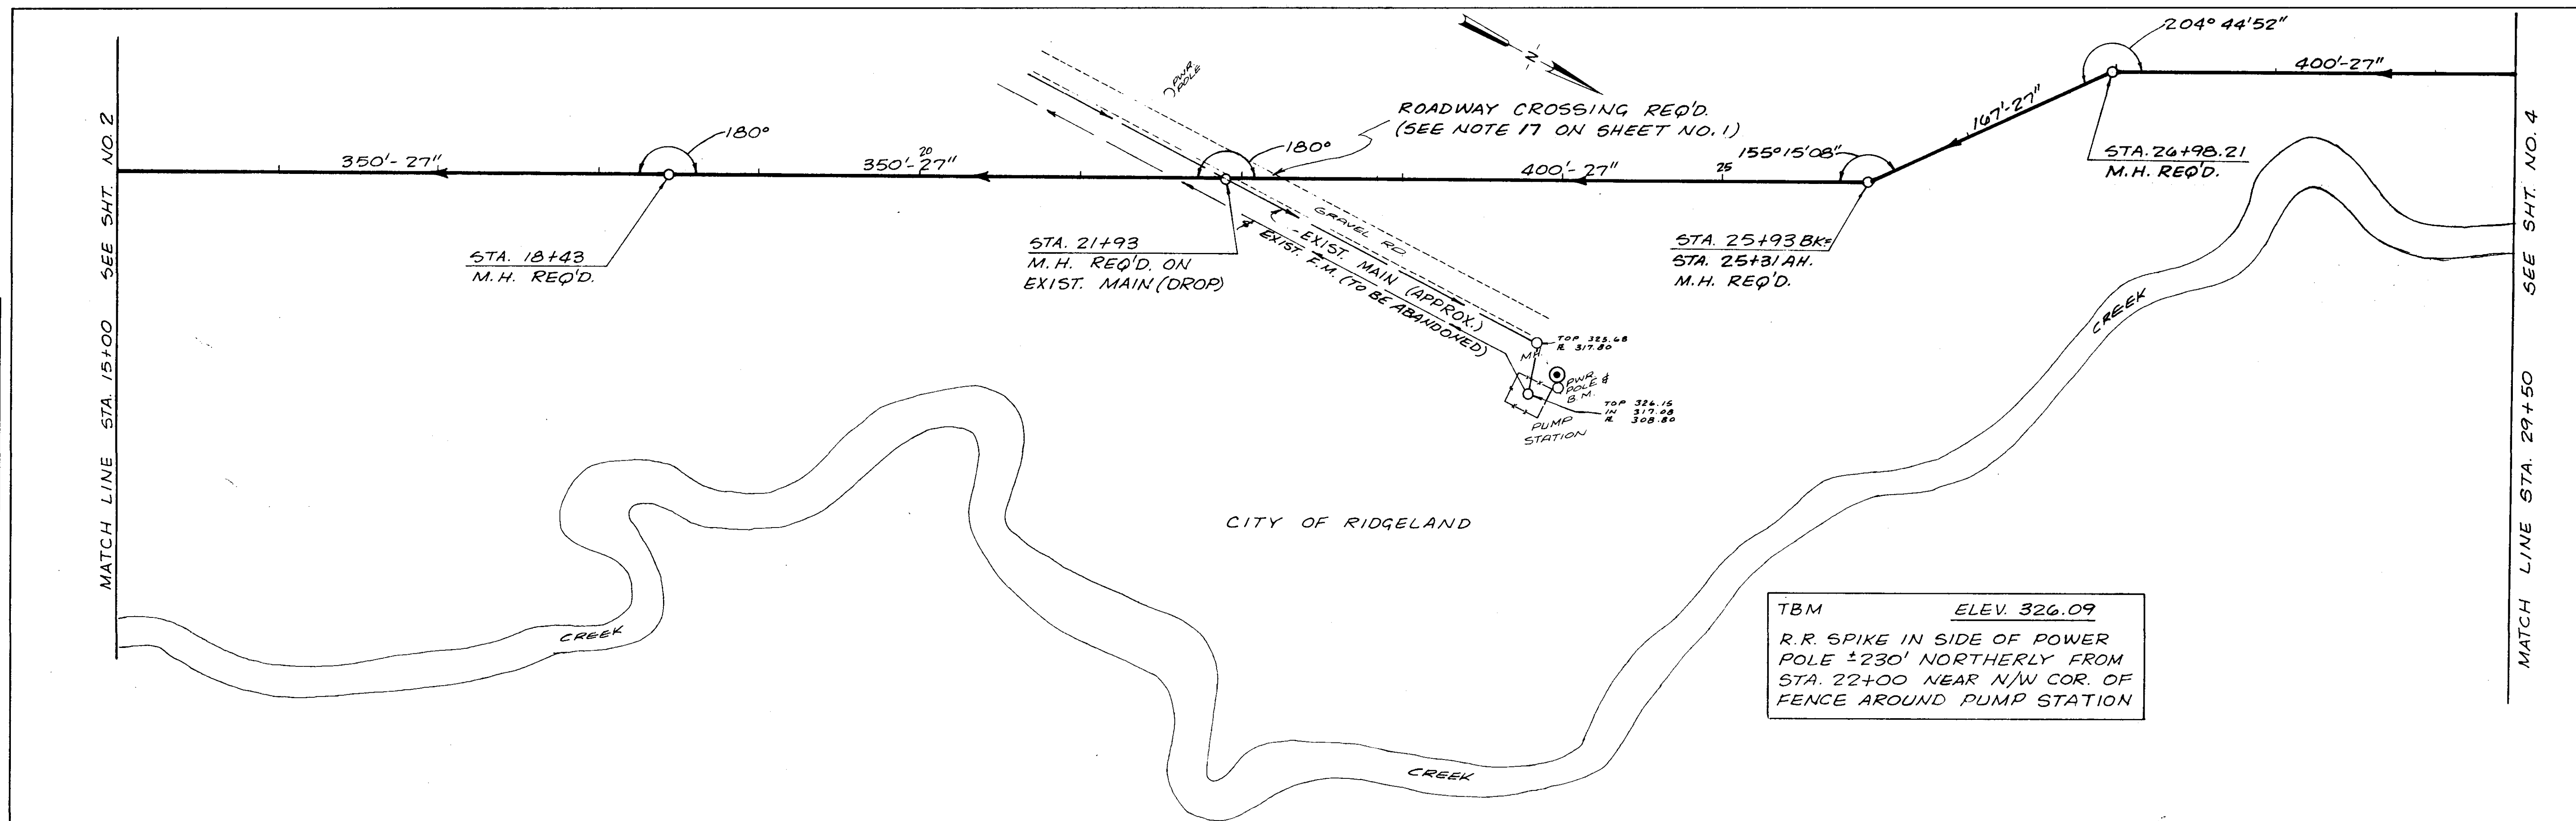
SINGLE PLAN AND PROFILE-FULL DOT
